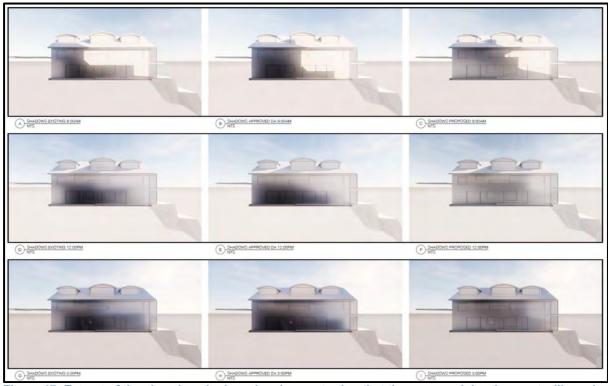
Extract of the elevation shadow plan demonstrating that the proposed development will result in a slight increase of overshowing in the morning to 46 Bower Street, which adjoins the subject site to the west, compared to the recently approved development
